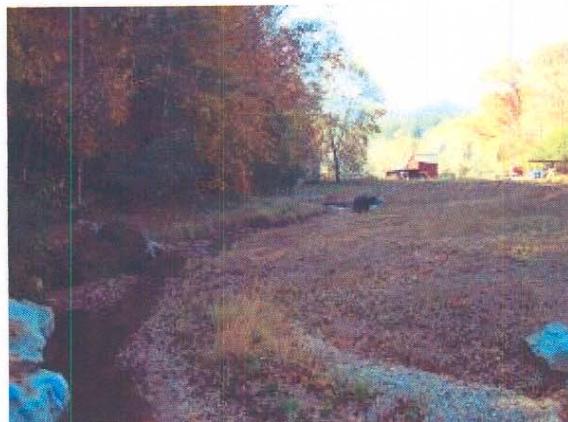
Looking downstream from as-built Station ~24+50.
